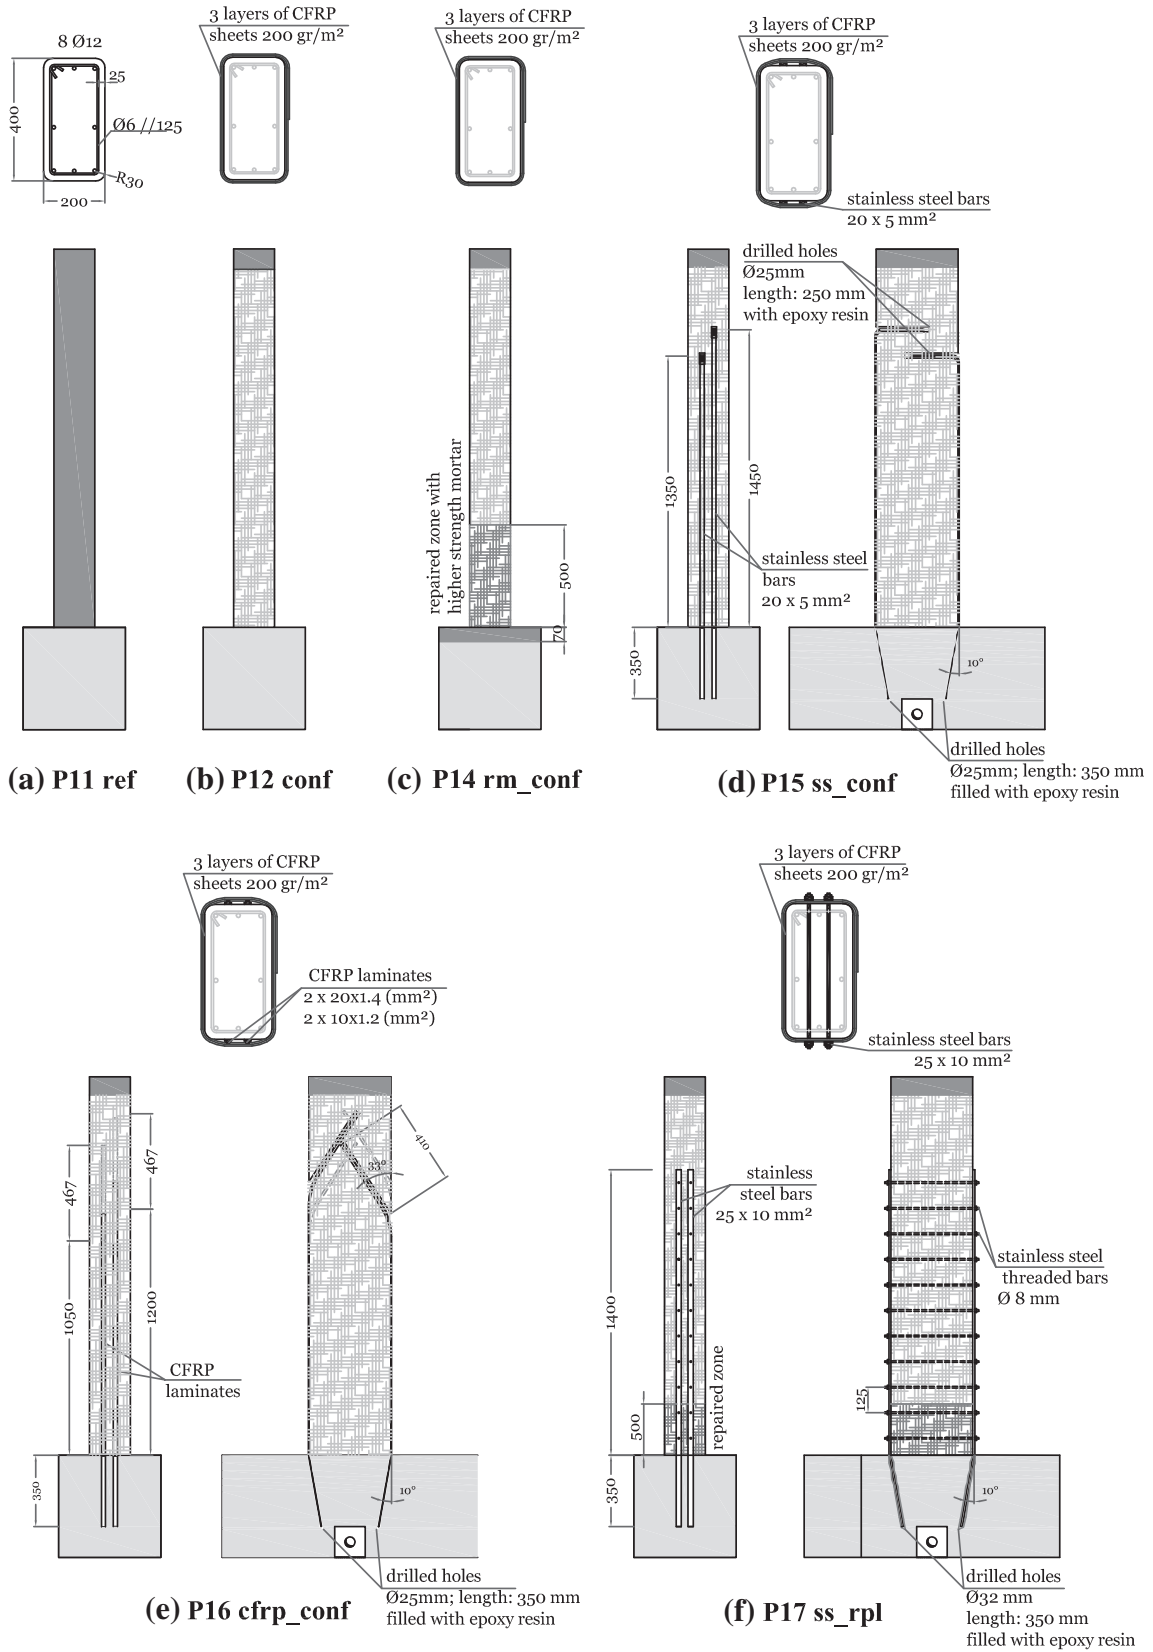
Geometry, reinforcement and strengthening detailing of the tested columns: (a) P11ref; (b) P12conf; (c) P14rm_conf; (d) P15ss_conf; (e) P16cfrp_conf; and (f) P17ss_rpl.
